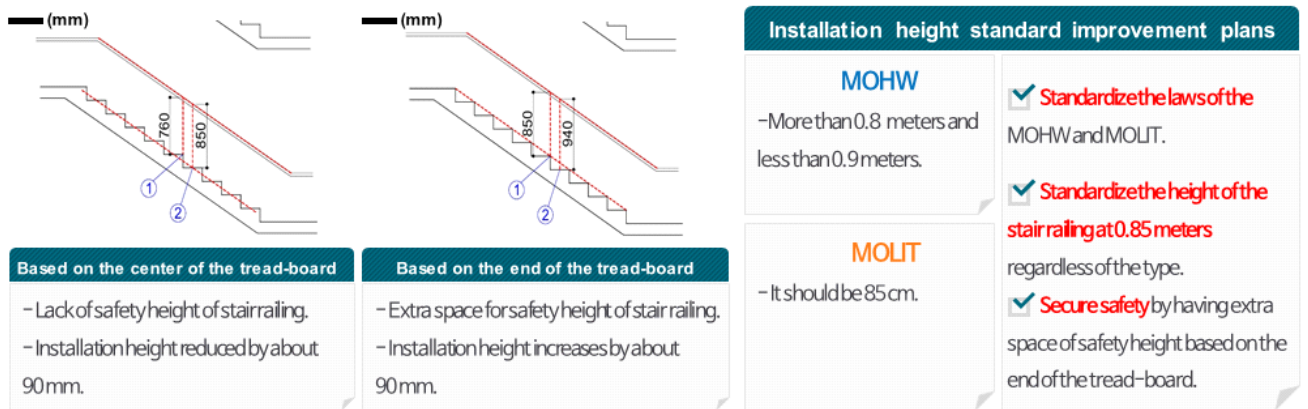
Estimation location and improvement plans for stair railing height standards of public facilities
